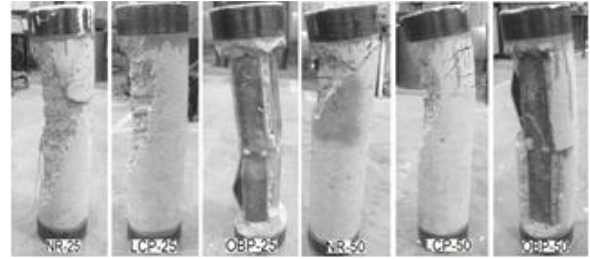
Failure modes of specimens under 25 mm and 50 mm eccentric loading
